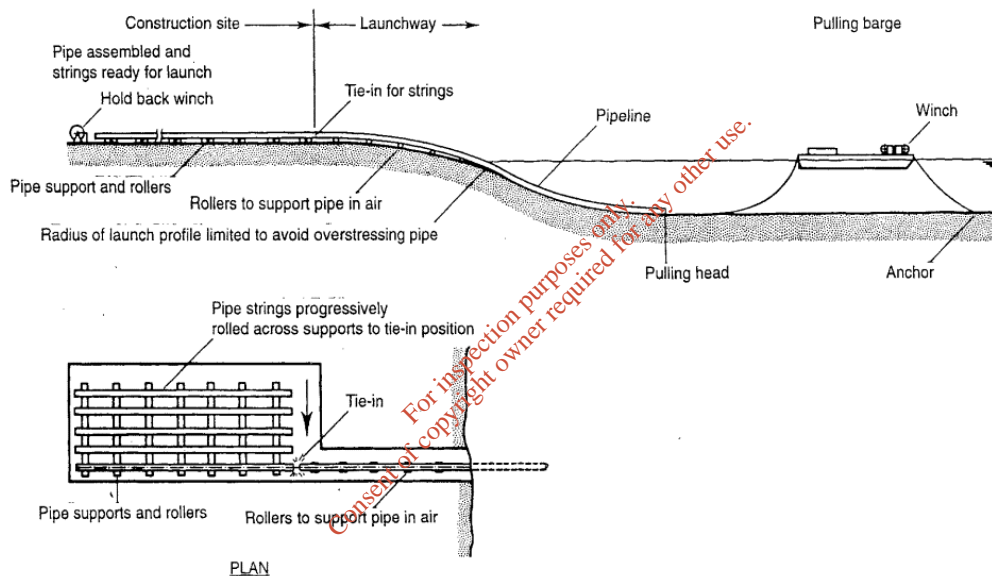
Bottom pull method of installing the outfalls (Source: CIRIA⁸)
